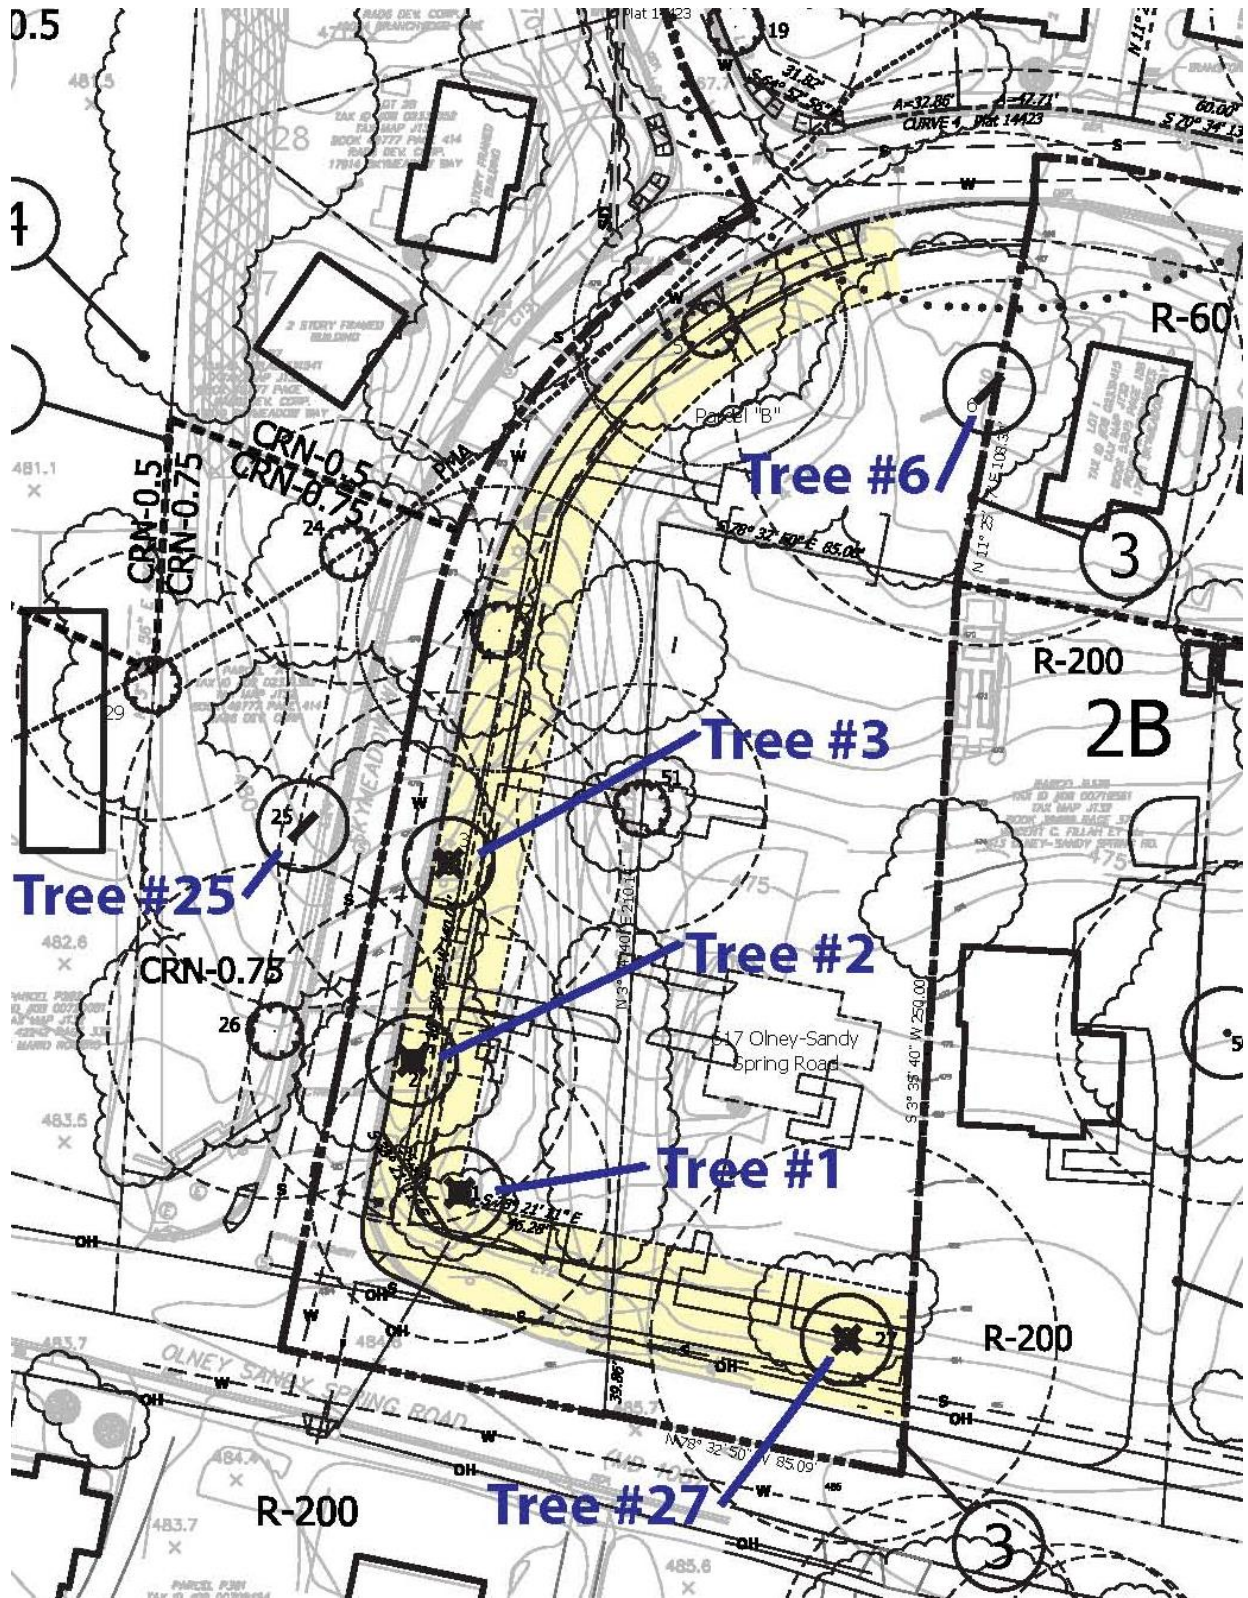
Detail of SNRI with proposed public improvements shown in yellow and impacted specimen trees highlighted.
